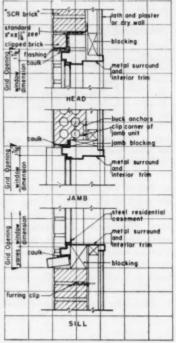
Steel residential casement window with metal surround in "SCR brick" wall. This detail is applicable to standard steel casement widths of 3' 1", 4' 5\%", and 5' 9\%"
